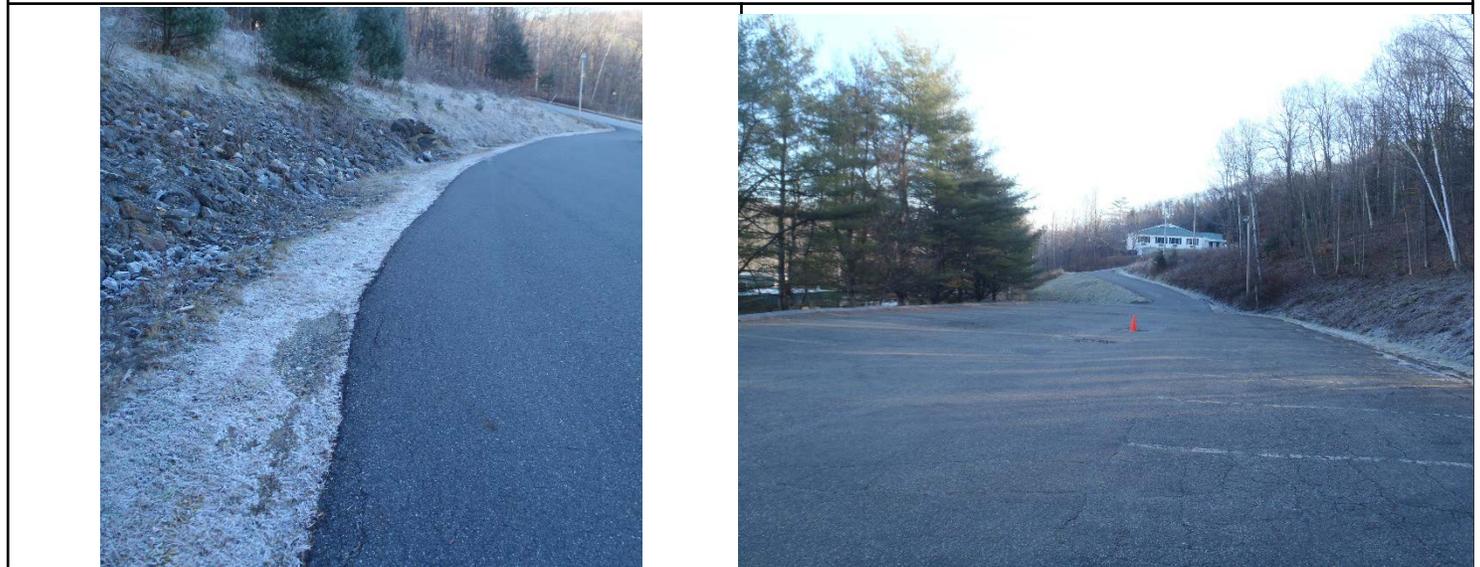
Drainage swale along north edge of VT NEA parking area Photo 2. Parking area at Leahy Press
